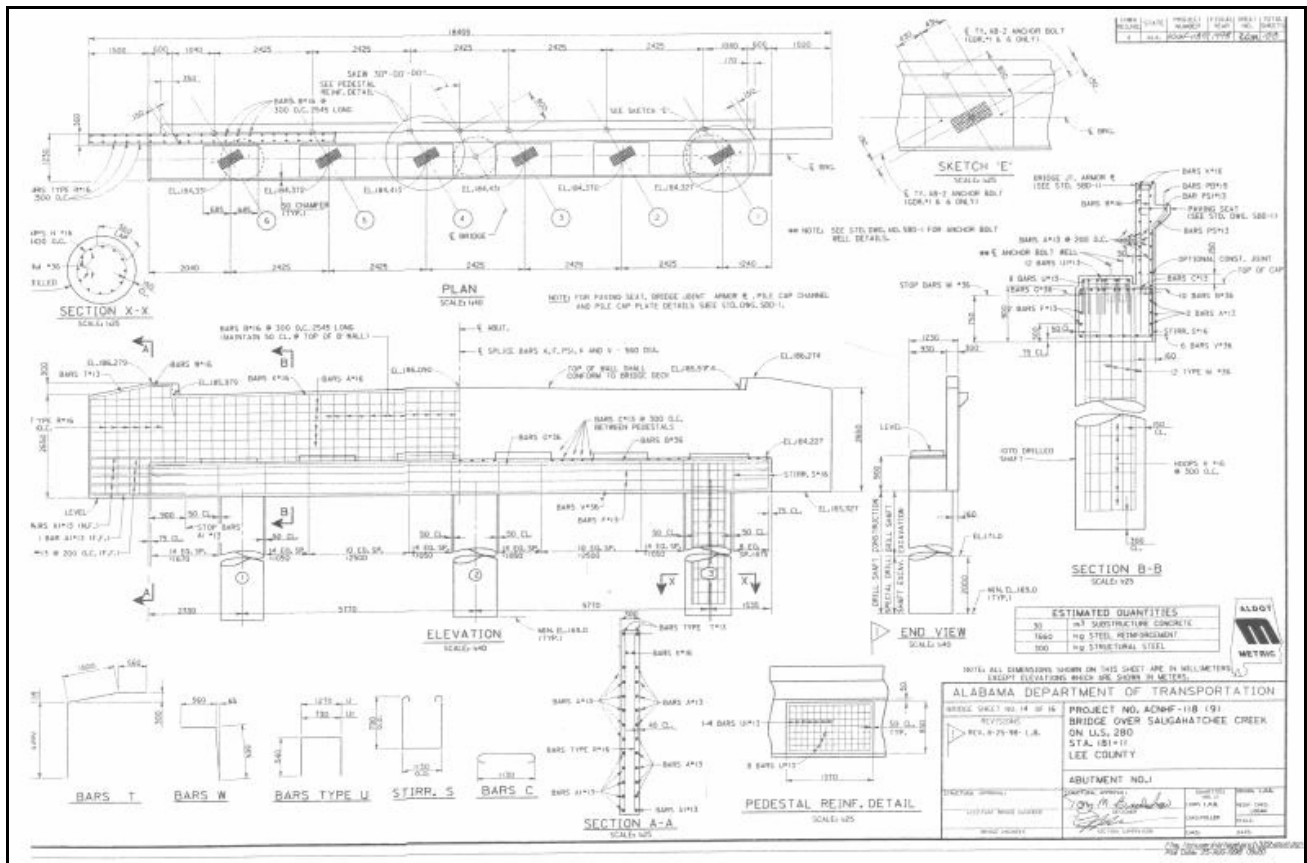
Plan sheet for Project No. NHF-118(9) in Lee County
